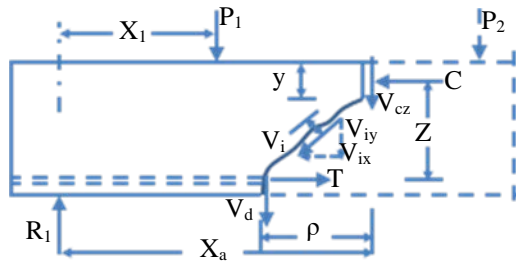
Shear forces in an RC beam with web reinforcement [24]
